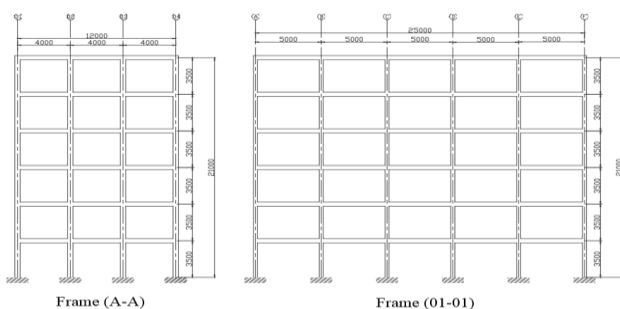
Frame (A-A) and (01-01) of six-story regular RC building (all dimension are in mm)
